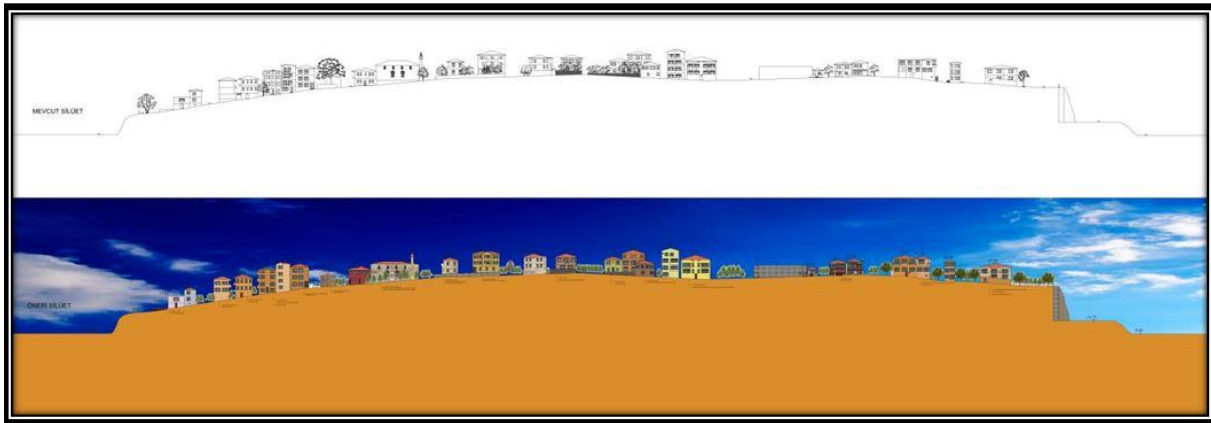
Actual and Proposal Northern Silhouettes of Kaleiçi Street
